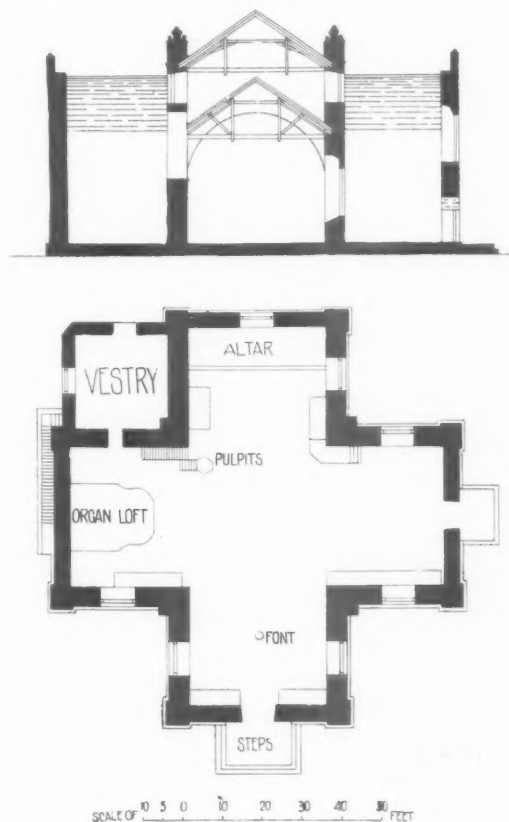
PLAN AND SECTION OF JAFFNA CHURCH.
